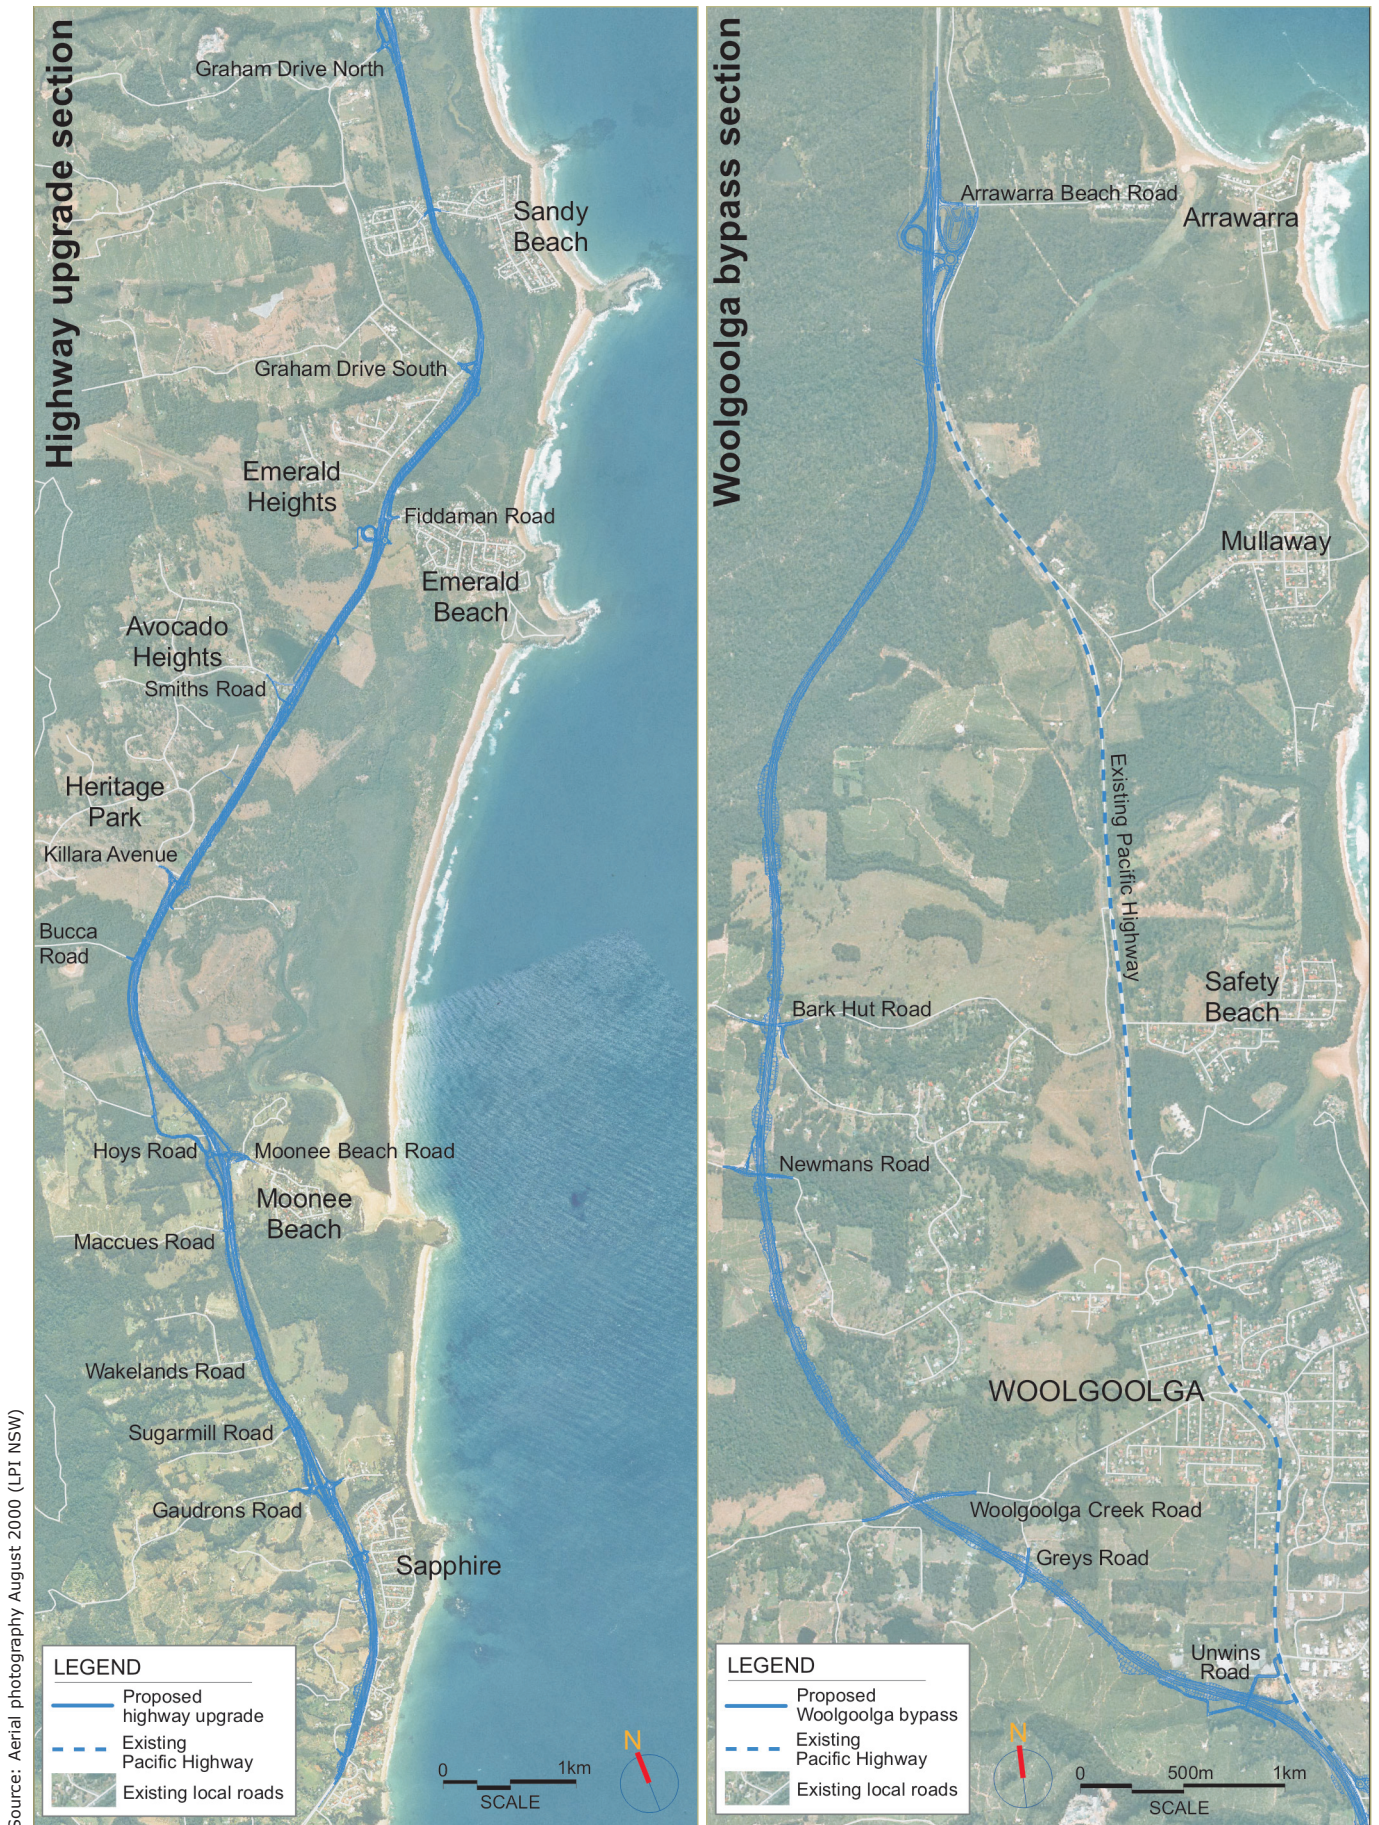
UPGRADE AND BYPASS SECTIONS OF THE PROPOSAL
